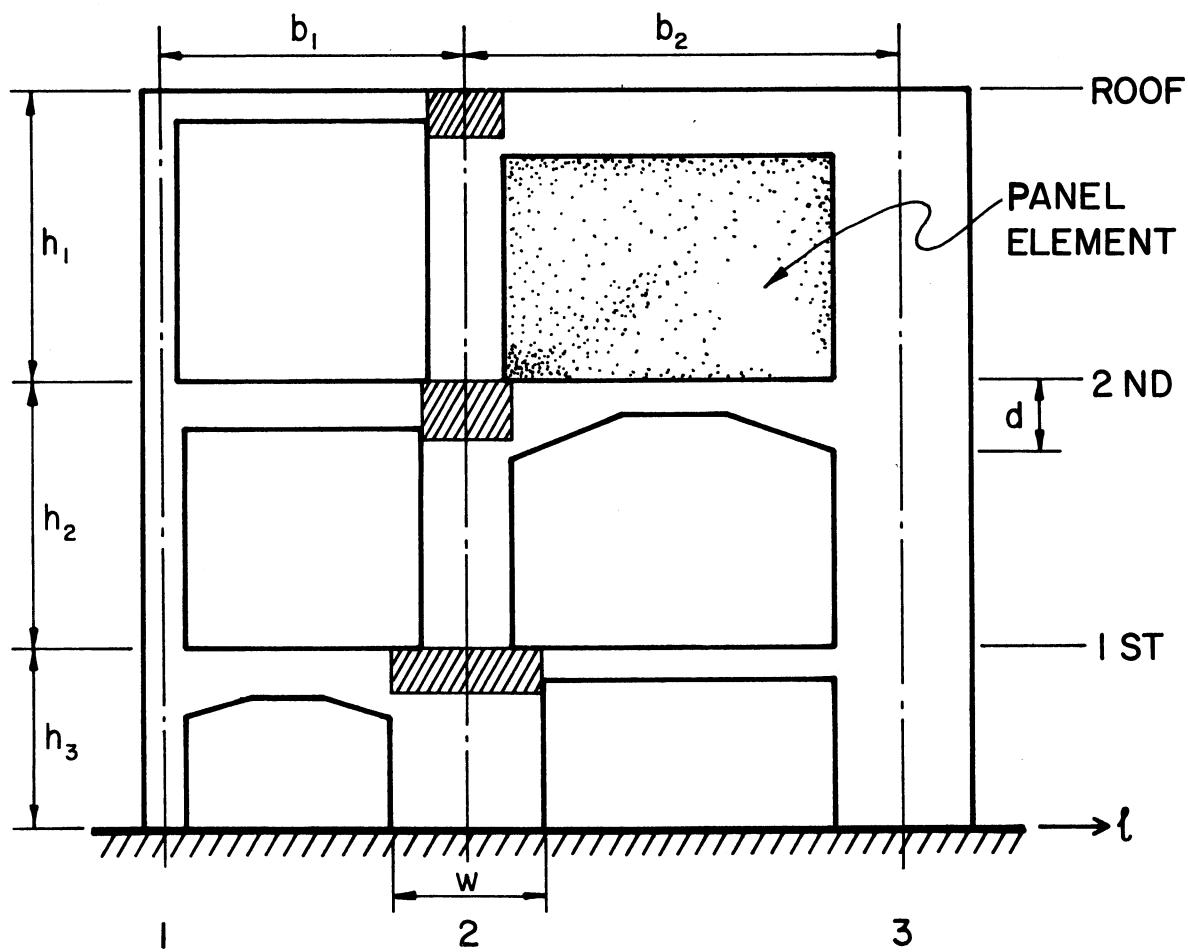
ELEVATION VIEW (TYPICAL FRAME)
